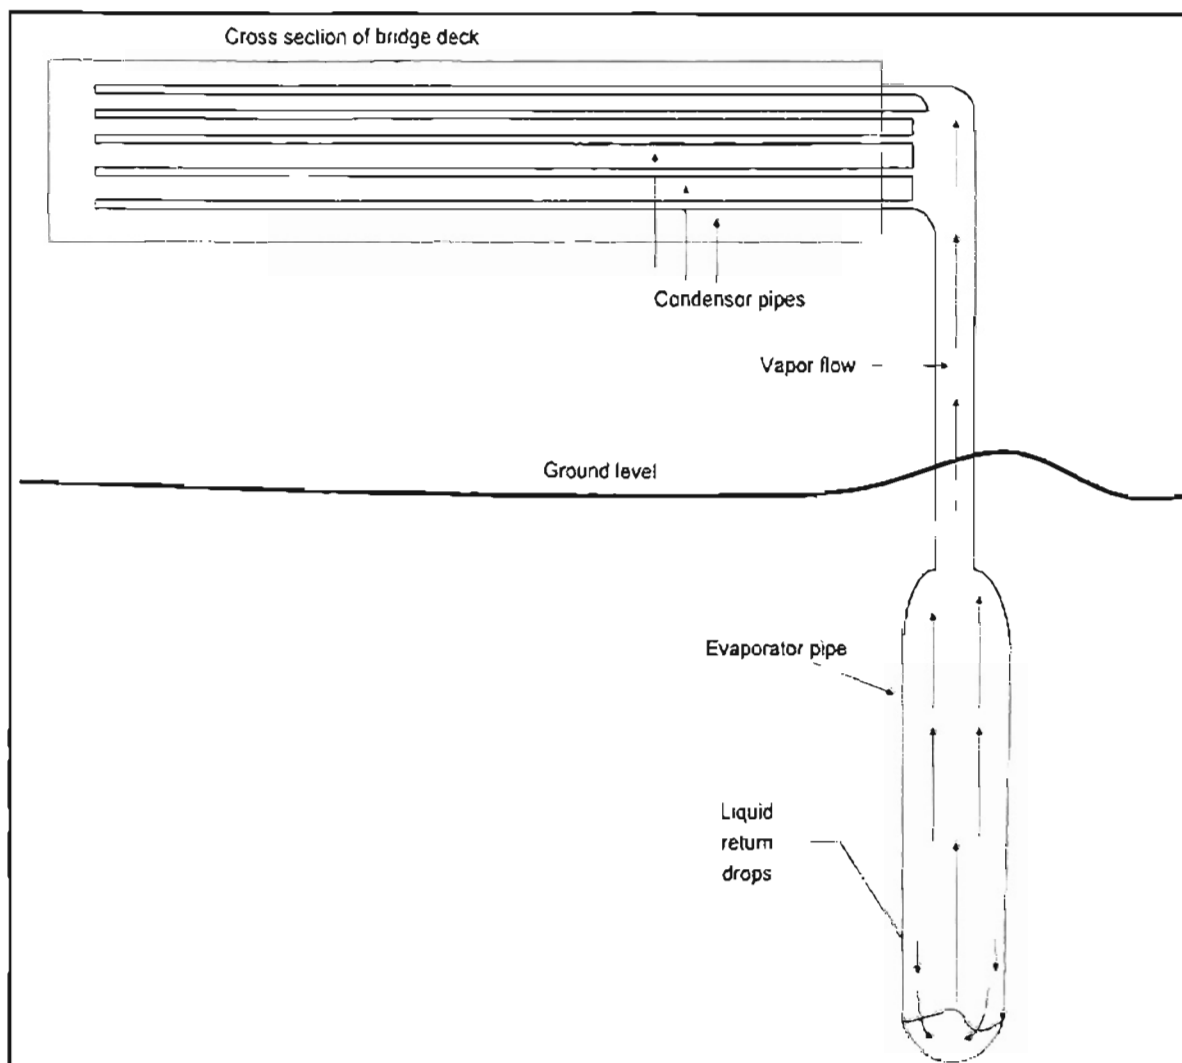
Schematic arrangement of "heat pipe" bridge deck heating system
